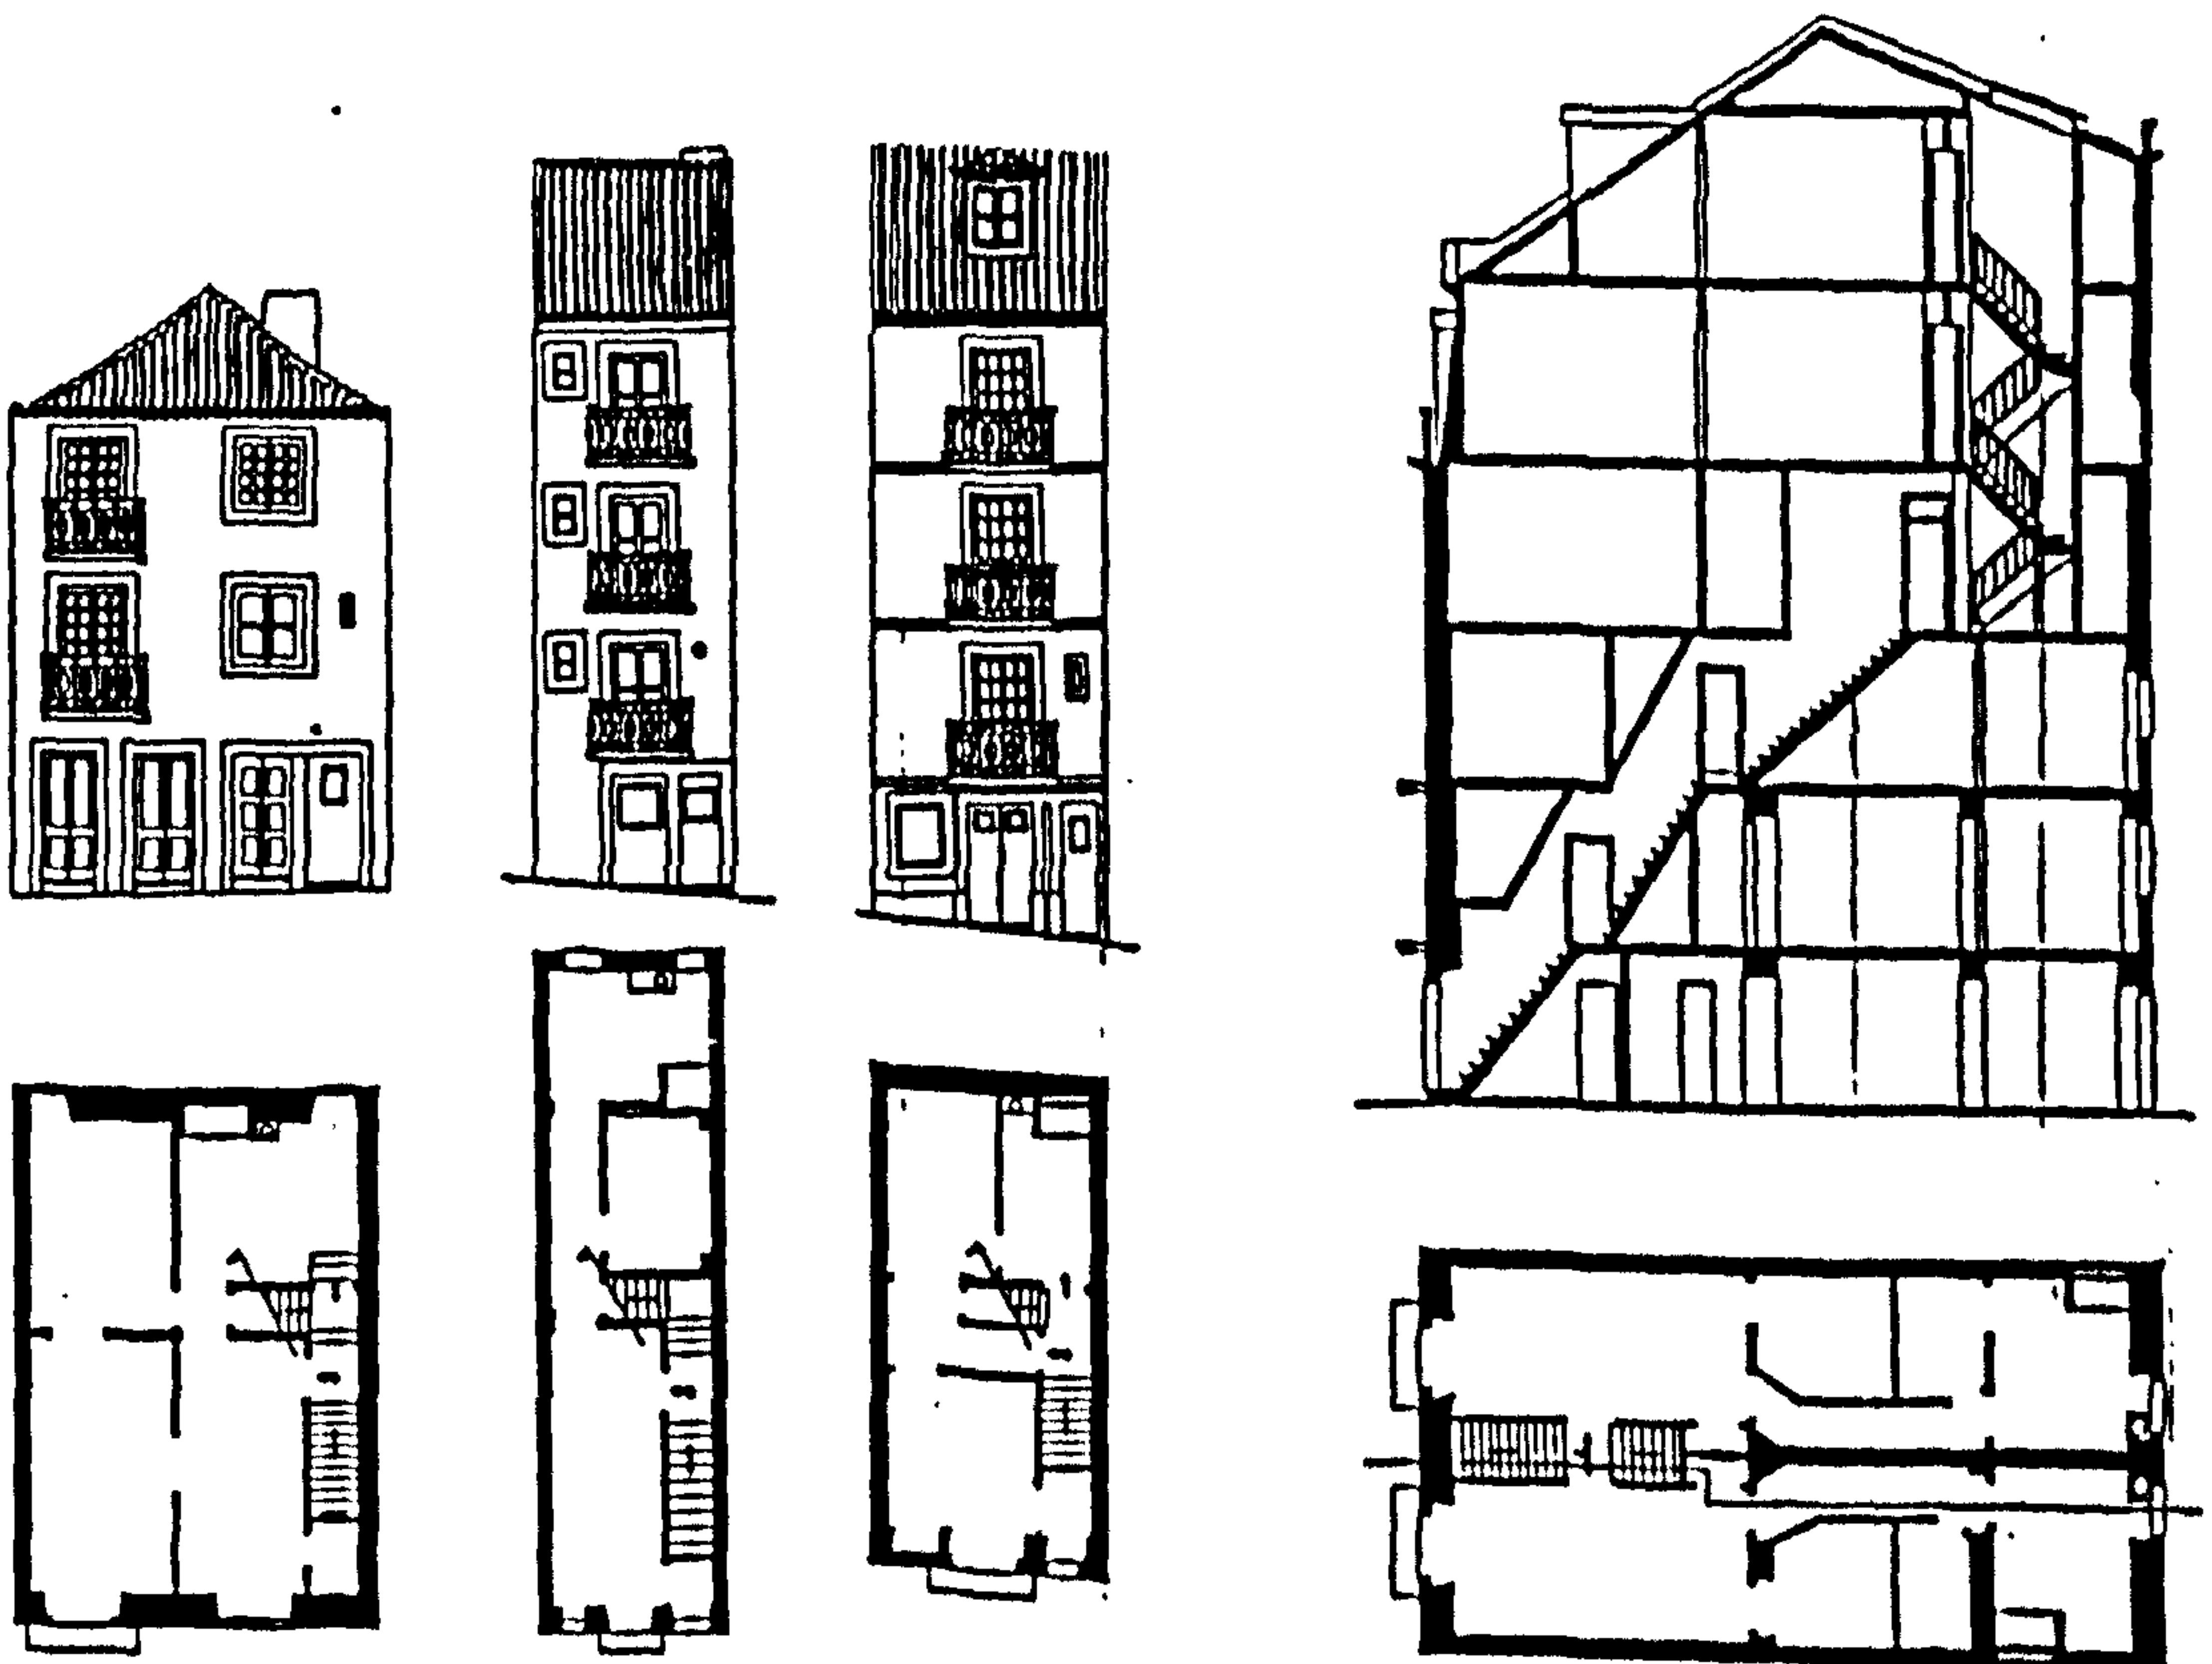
Medieval buildings, elevations and plans Fig.278-Medieval building, section and plan
